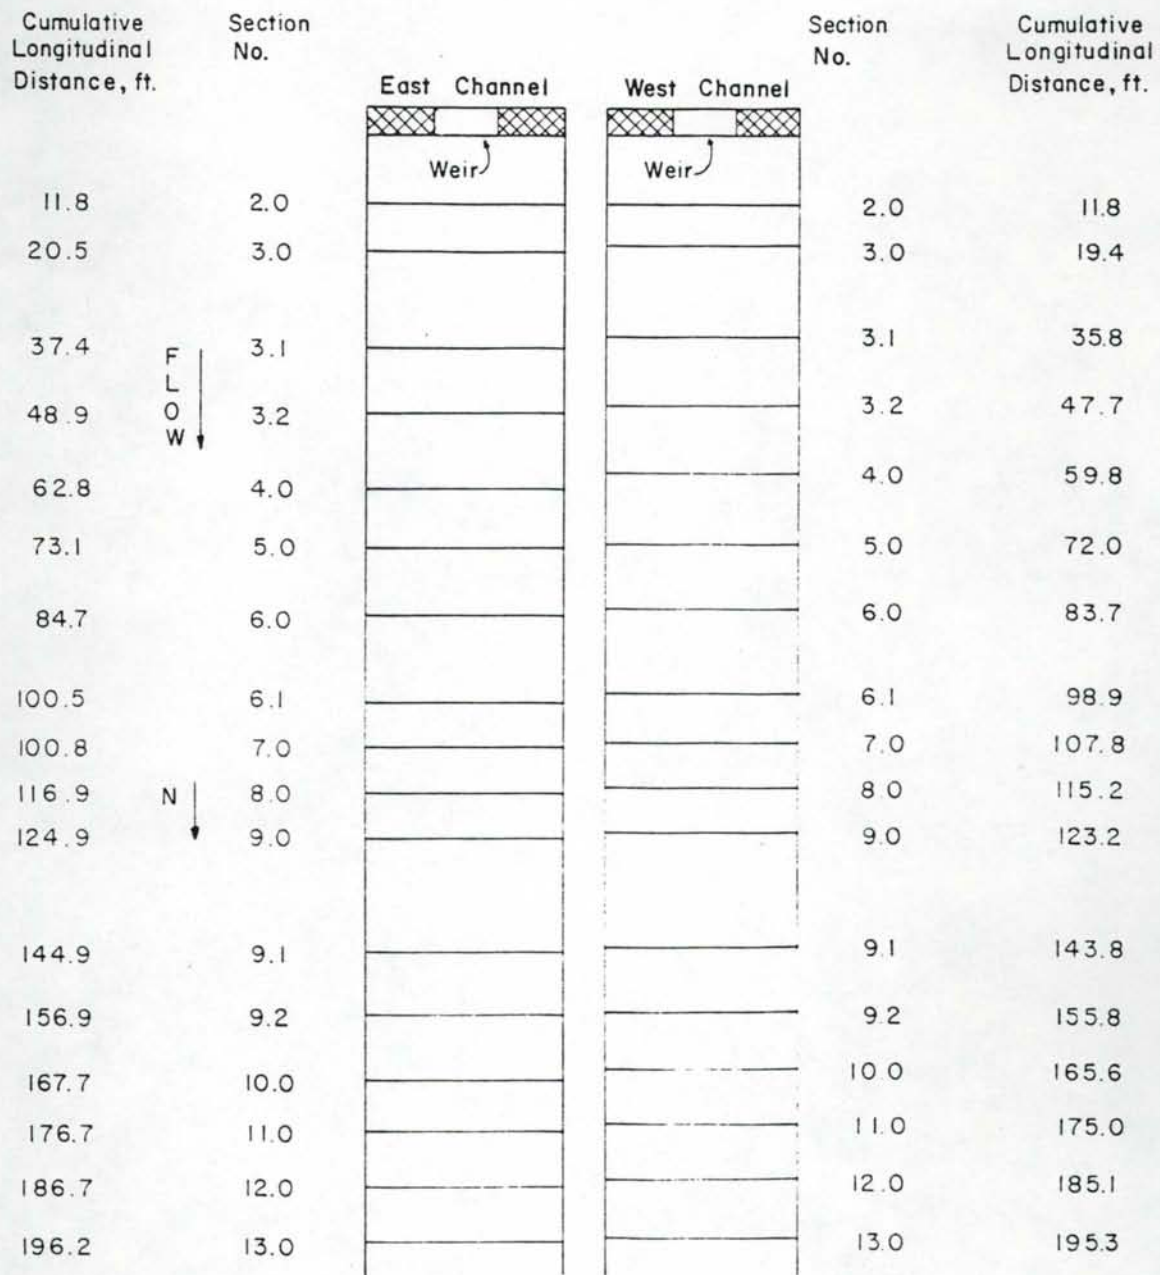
Plan view of the Troy channels cross-section layout for the summer data collection period.
